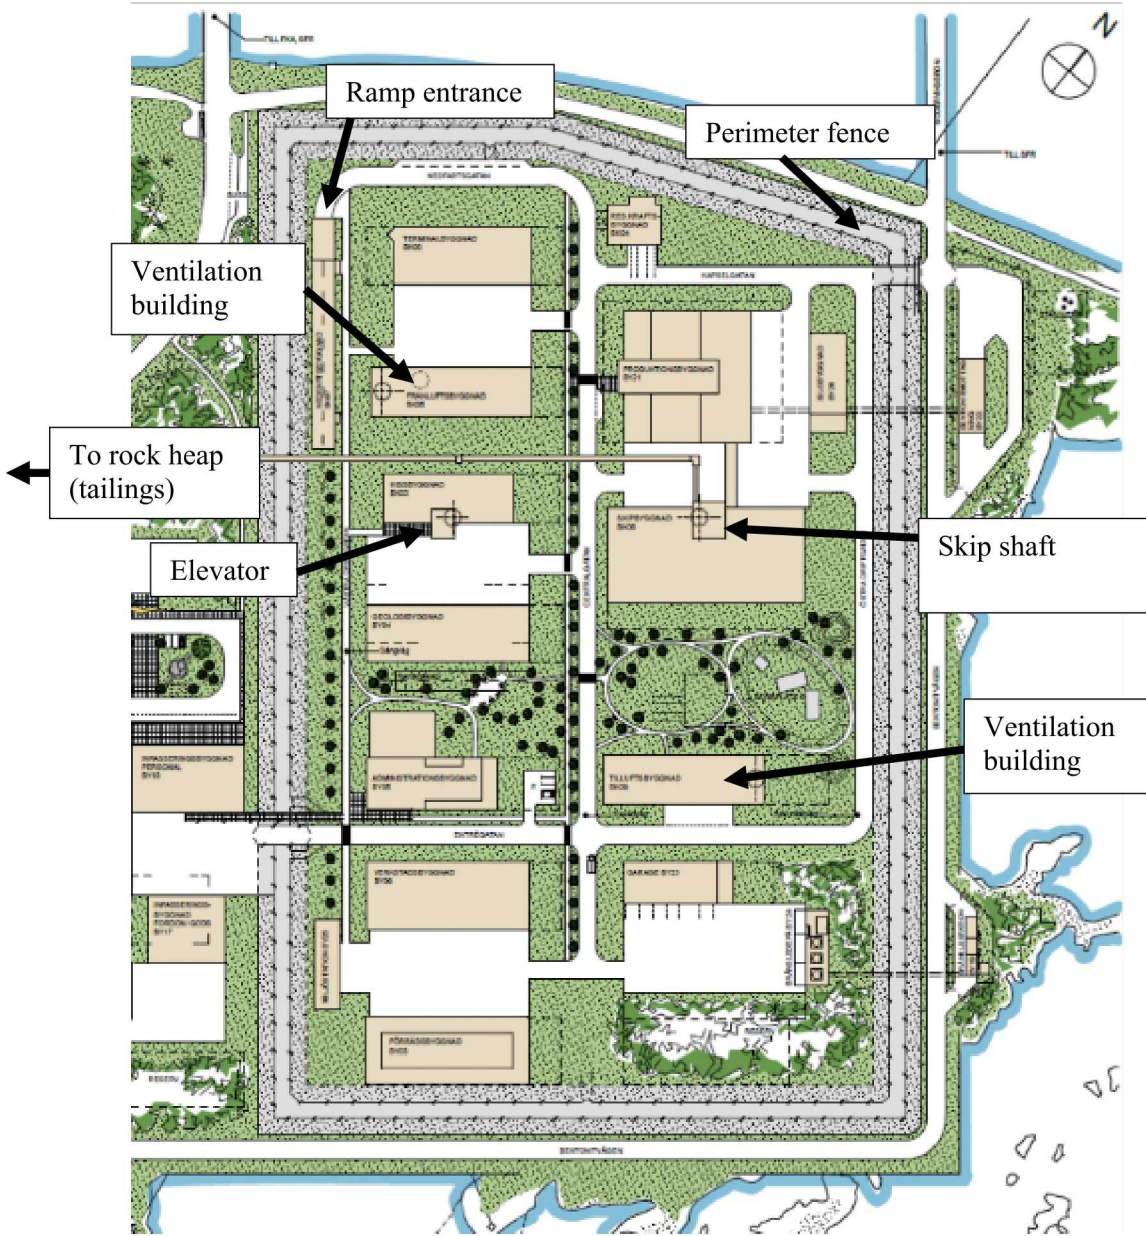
Plan view of Sweden’s prospective GR facility showing surface facilities in relation to underground workings. Note the spiral emplacement ramp and four vertical shafts (two for ventilation, one each for personnel and excavation [skip] shaft); off-site tailings pile not shown. Source: Slide #8 in [11].
